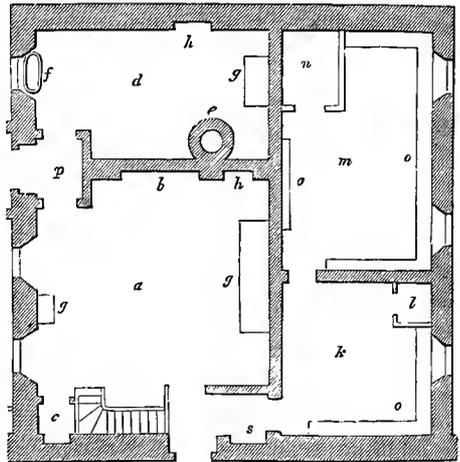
Ground-plan of a kitchen, &c., of farmhouse.
